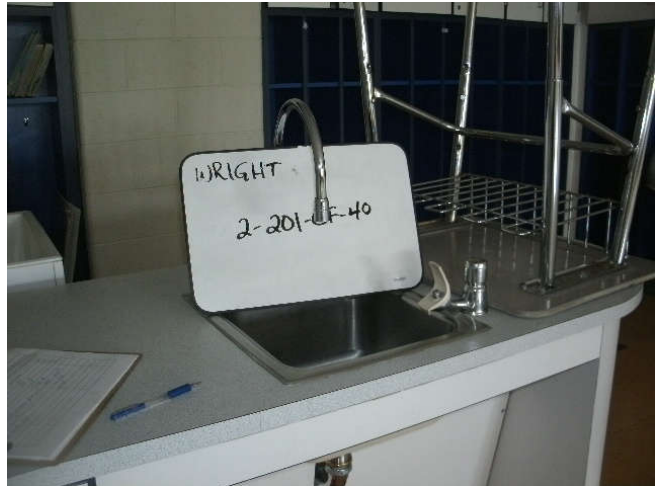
Classroom faucet w/bubbler, located on the 2nd floor, in room 201.
